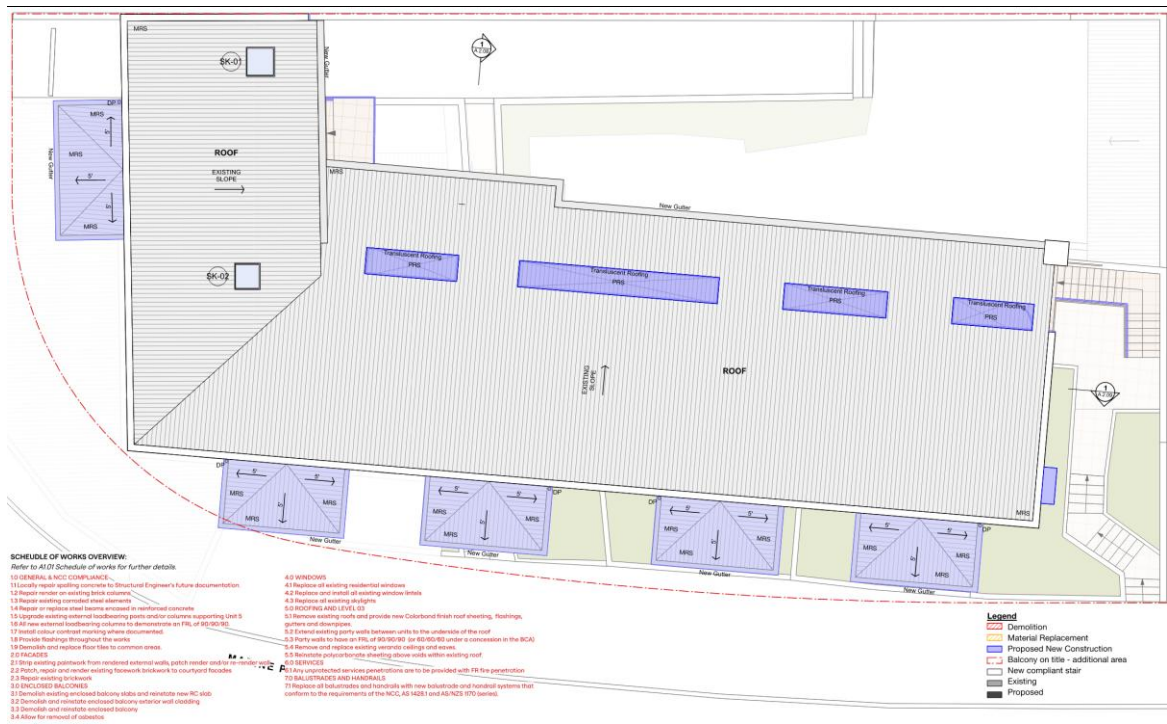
Proposed Roof Plan (Source: Hill Thalys – 05/12/2025)
